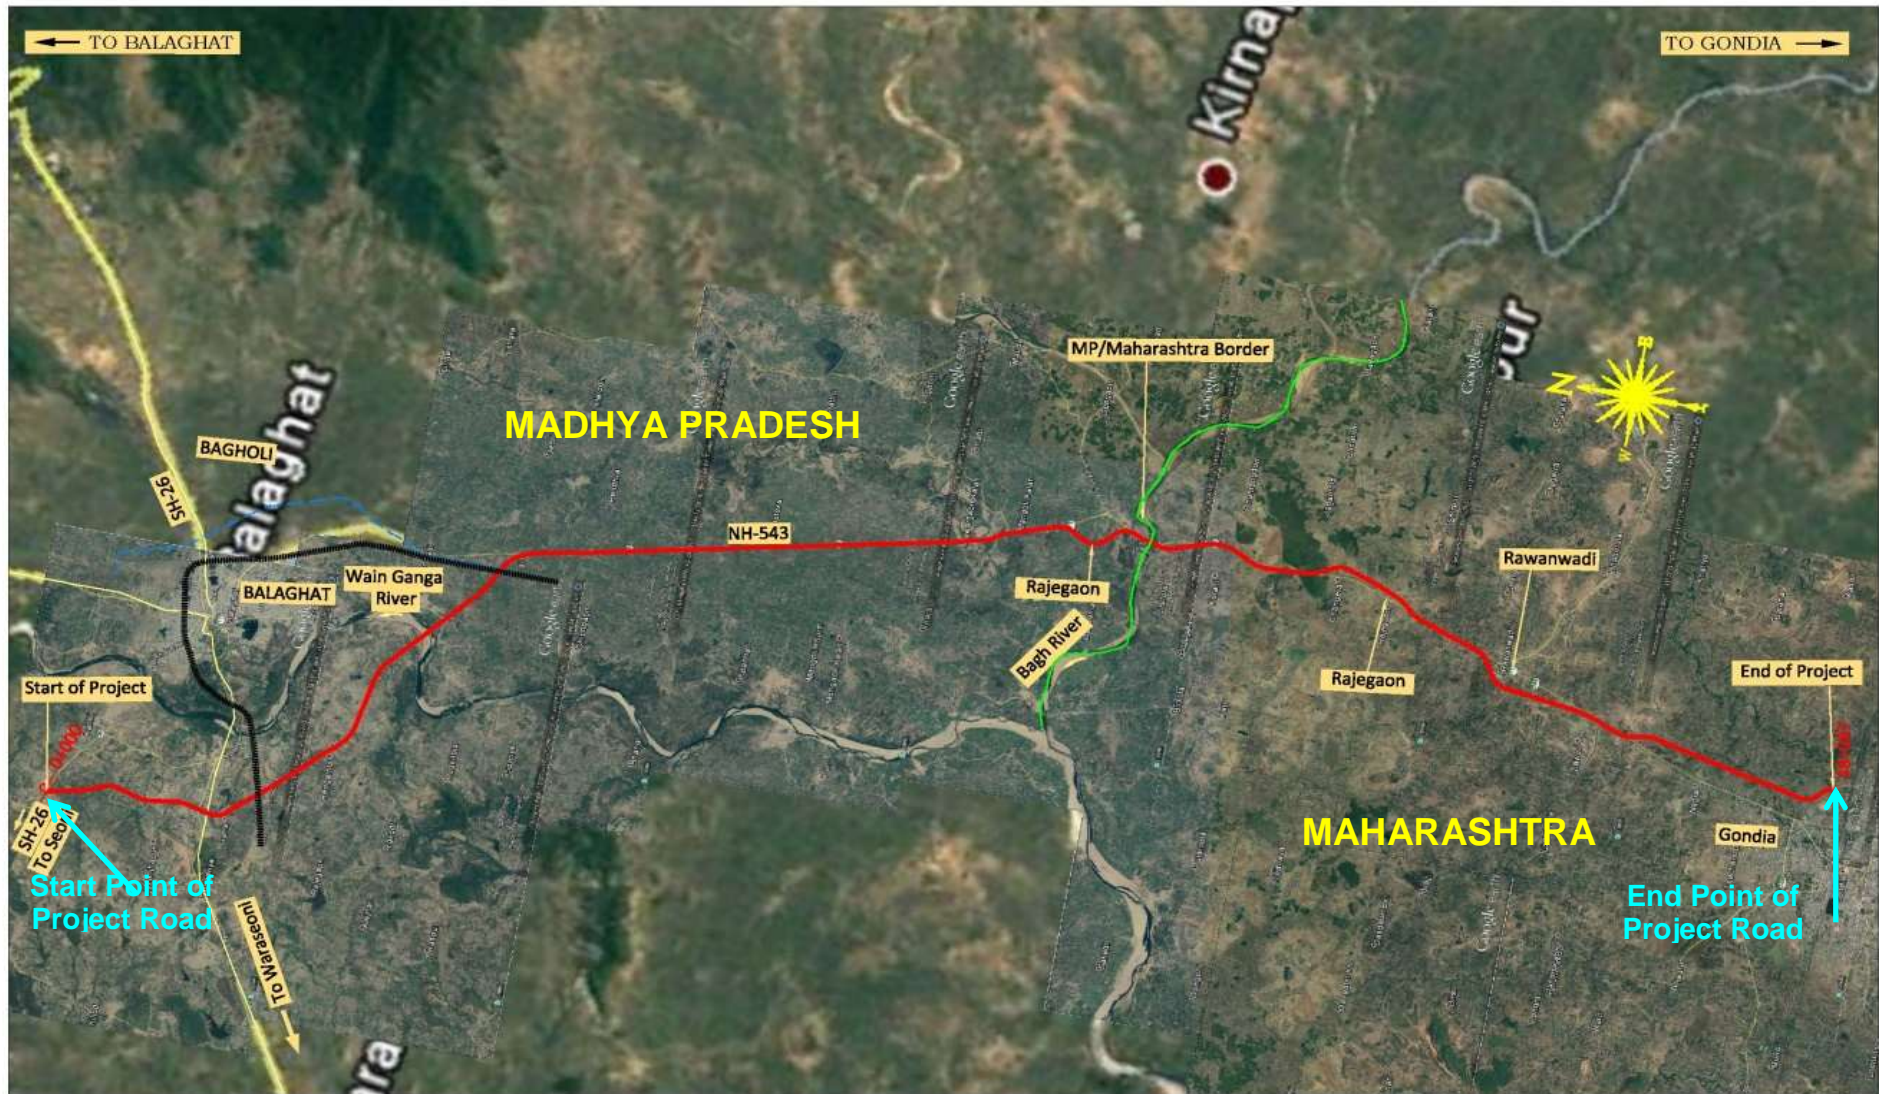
Recommended Alignment of Balaghat - Gondia Section
